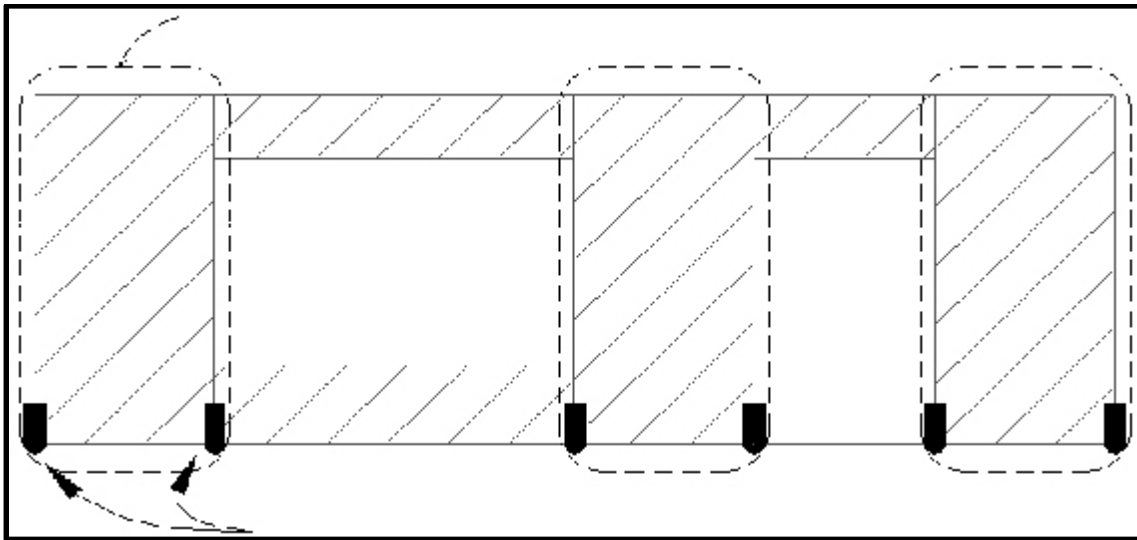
Typical Shearwall Composed of Three Traditional Shearwall Segments (Type I)
